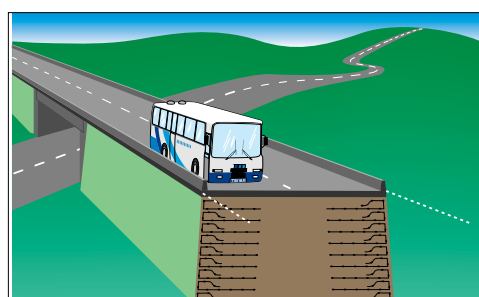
Typical geogrid reinforced wing wall with vegetated face butted against the bridge abutment (traditional or made of geogrid reinforced soil).
